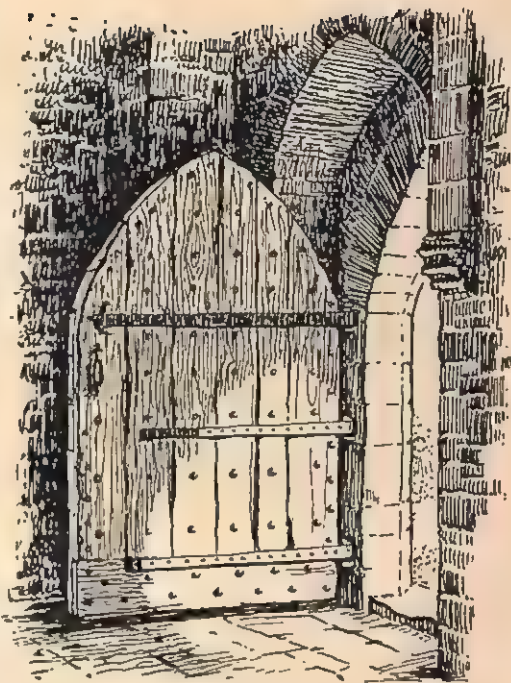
A door made 700 years ago. It is two layers of planks fastened together with wooden "nails". Note that it does not fit into a frame, but covers the opening and is hinged directly to the wall.
